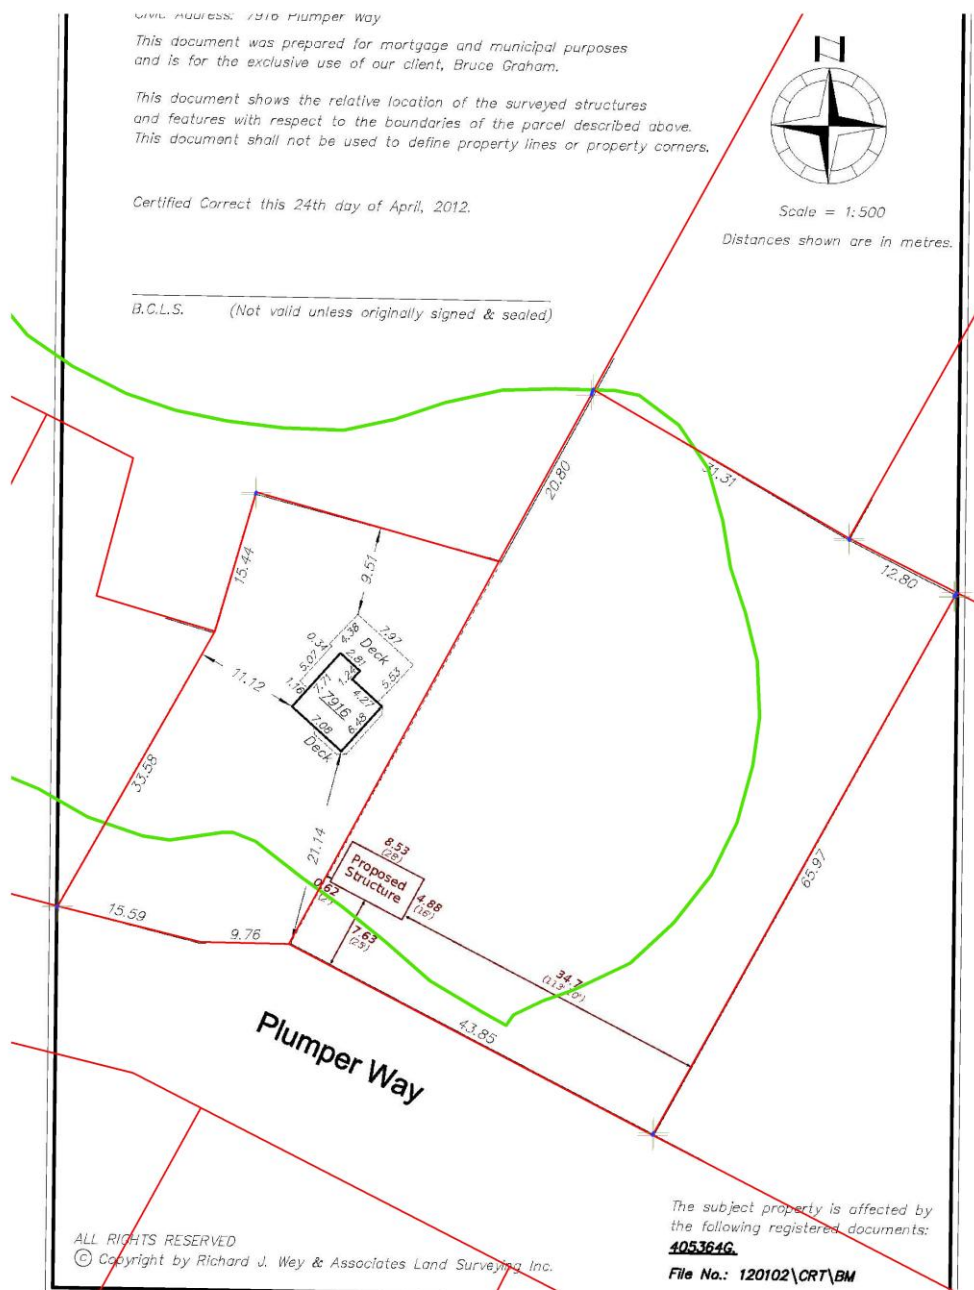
Survey Plan showing details of proposed development (deck, stairs, garage, parking area)—faint green line is DPA boundary
